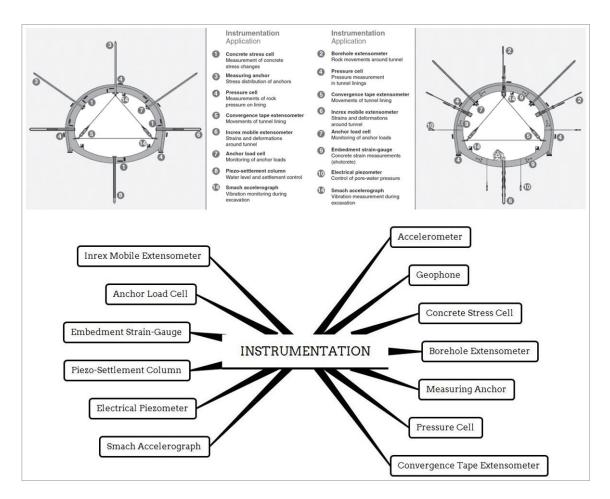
Instrumentation methods in underground excavations (Modified after Rahimi and Sharifzadeh (2017))
